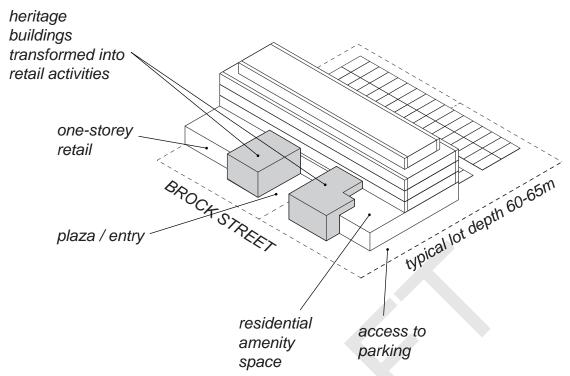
Demonstration Plan of protection strategy for Heritage Building parcels
